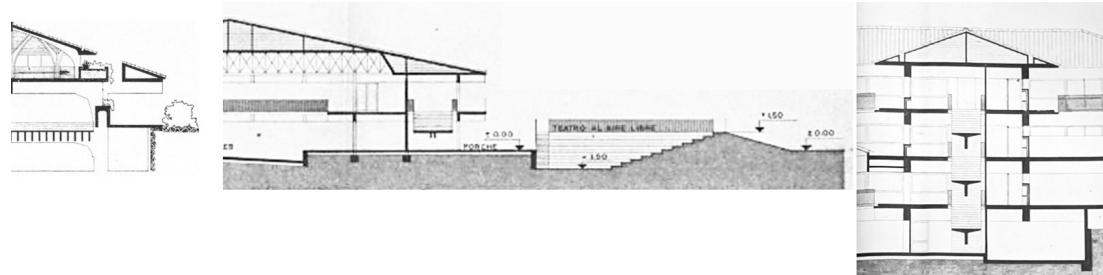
Roof and eaves of the Colegio Estudio, staircase and theatre of the Aljarafe school and staircase of the type H school. Source: Casa de la Arquitectura and Higueras Collection, COAM Historical Archive.
